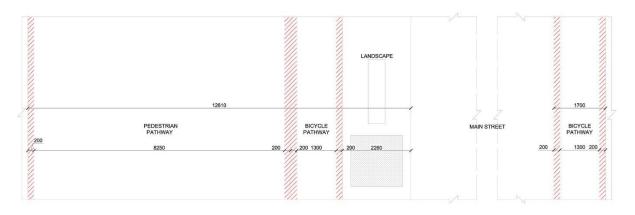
Street width and buffer spaces (in mm) for Gateway 3 in the area surrounding Marktplatz in Offenbach am Main Note: The street included on-going construction work on the adjacent pedestrian pathway (which is not taken into crowding calculation)
